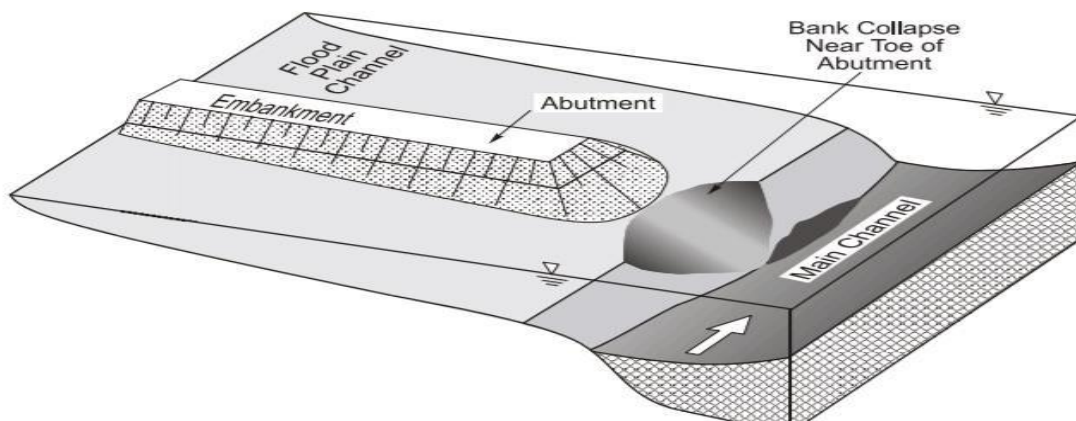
Local scour around abutment. (Source: Padmini Khwairakpam, 2009)
